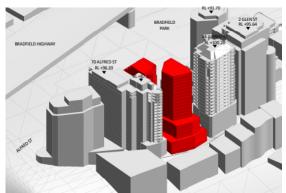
Amended building envelope responding to proposed DCP (from Glen Street)
